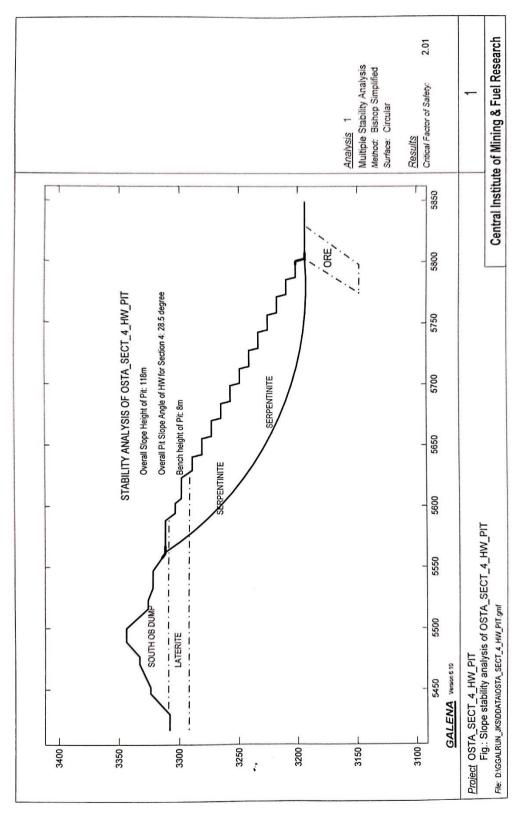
Slope stability analysis of Hangwall Pit along Section Sect-4
